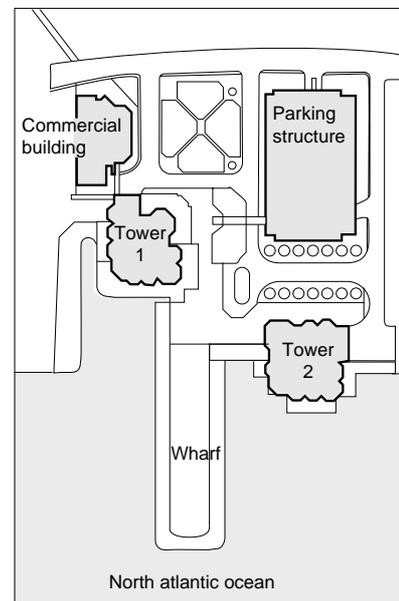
Building layout. Purdy's Wharf complex comprises two towers, a commercial building and a parking garage.
